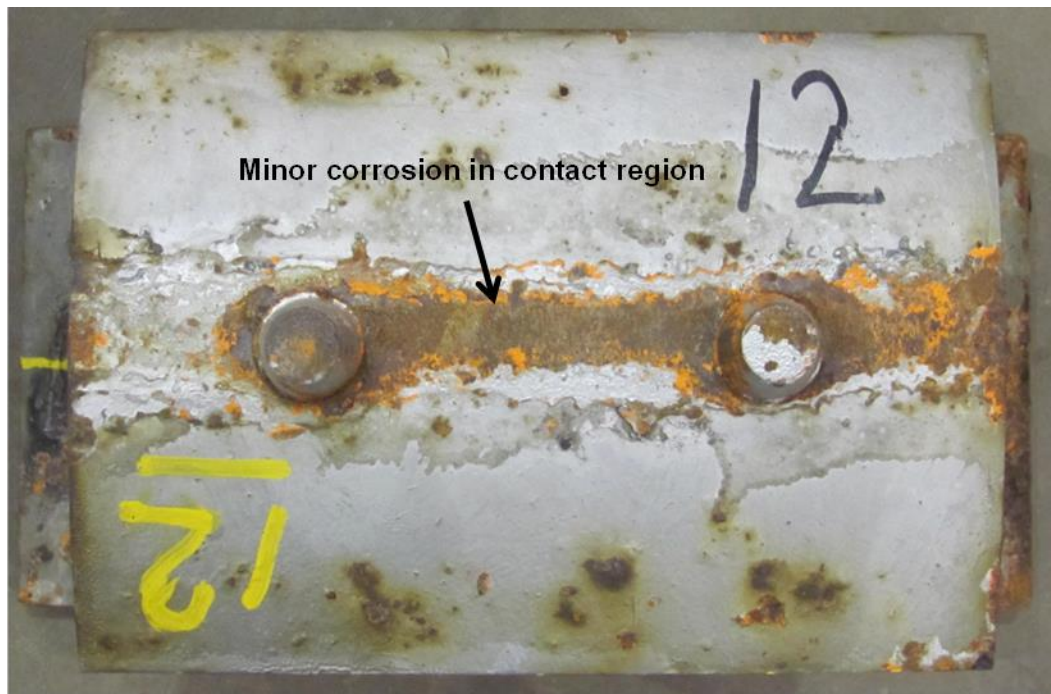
Top contact surface of Bearing PB12 in the as-received condition
